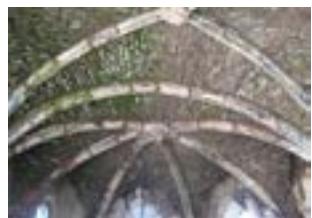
Vaulted stone floor - (photo: Grămescu Ana Maria)
